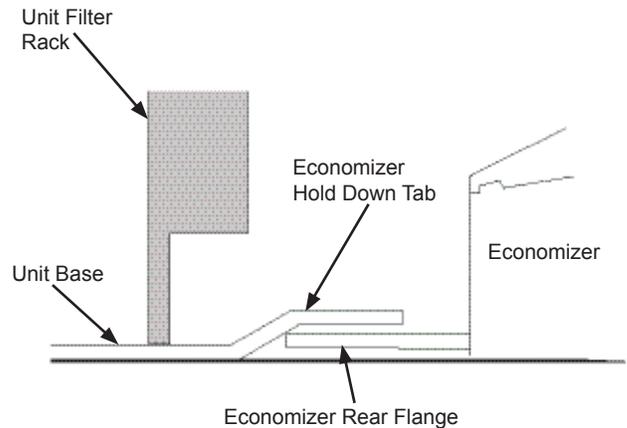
Rear Economizer Flange Installation (Small and Large Cabinet)
